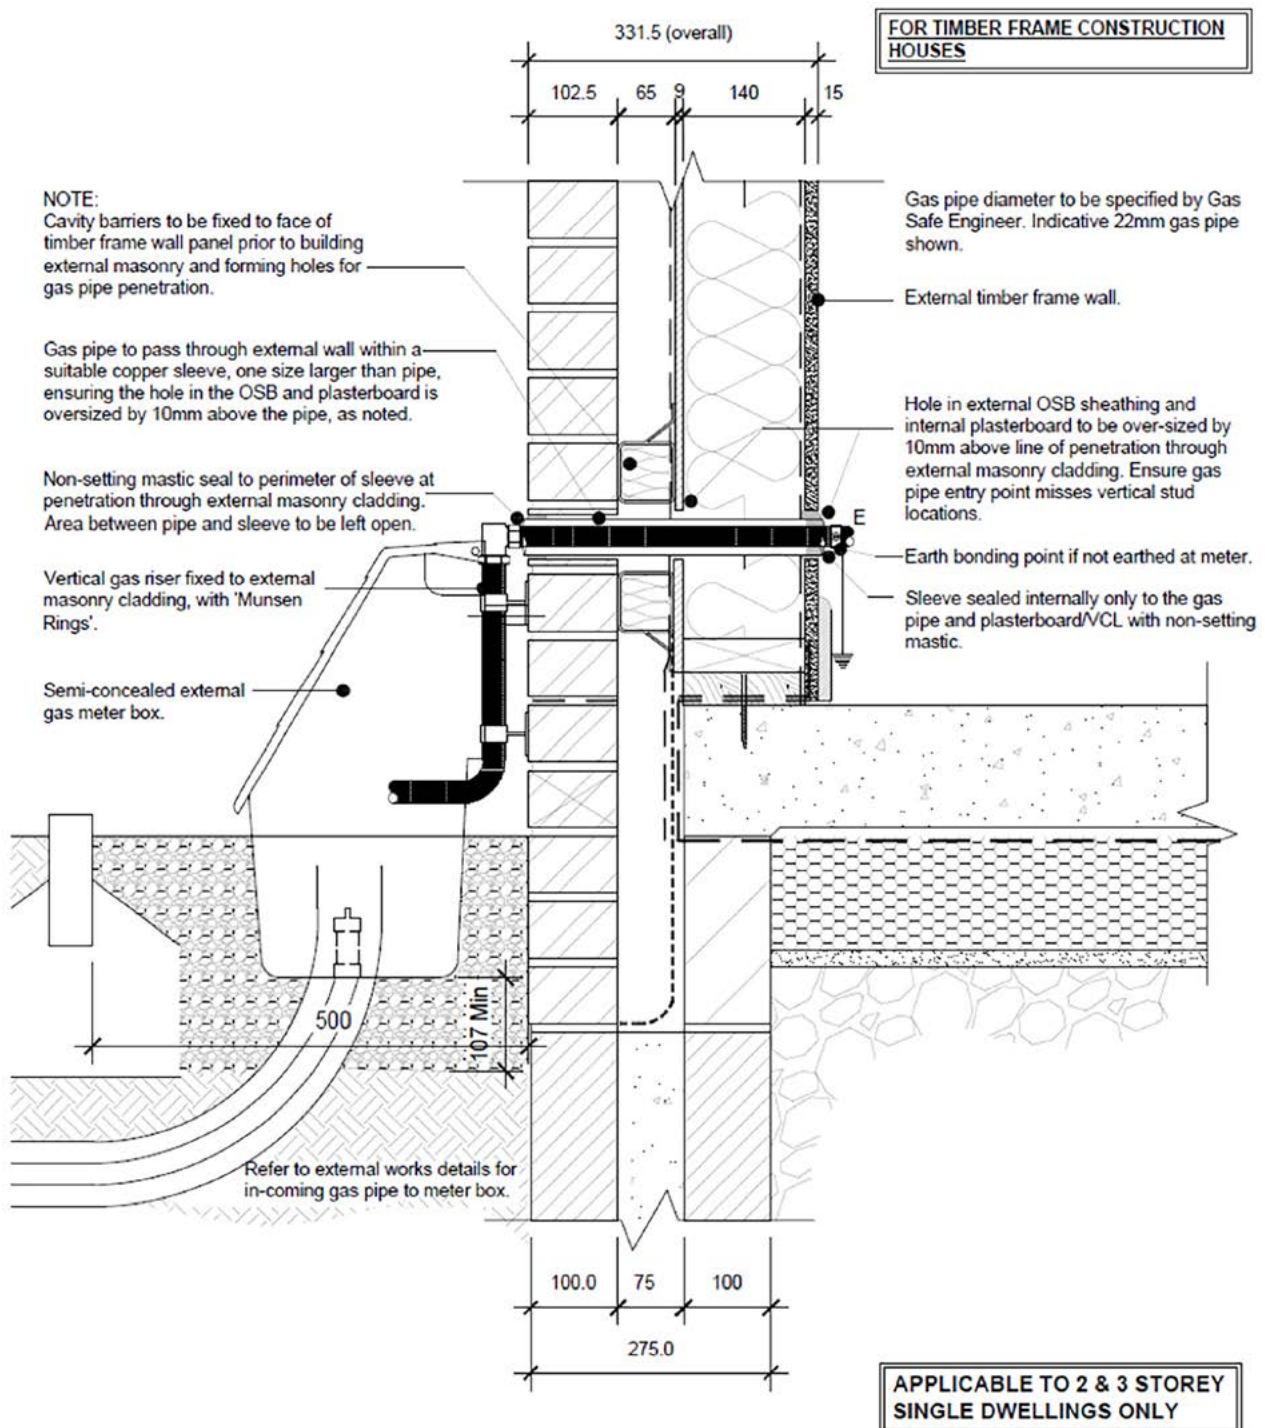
Gas Pipe Entry at Ground Floor External Wall
